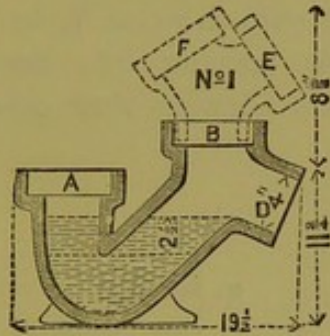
Vertical Section of "Combination Soil-pipe Trap" with "Connecting-piece" for ventilating the Drain, and for access to Trap.
